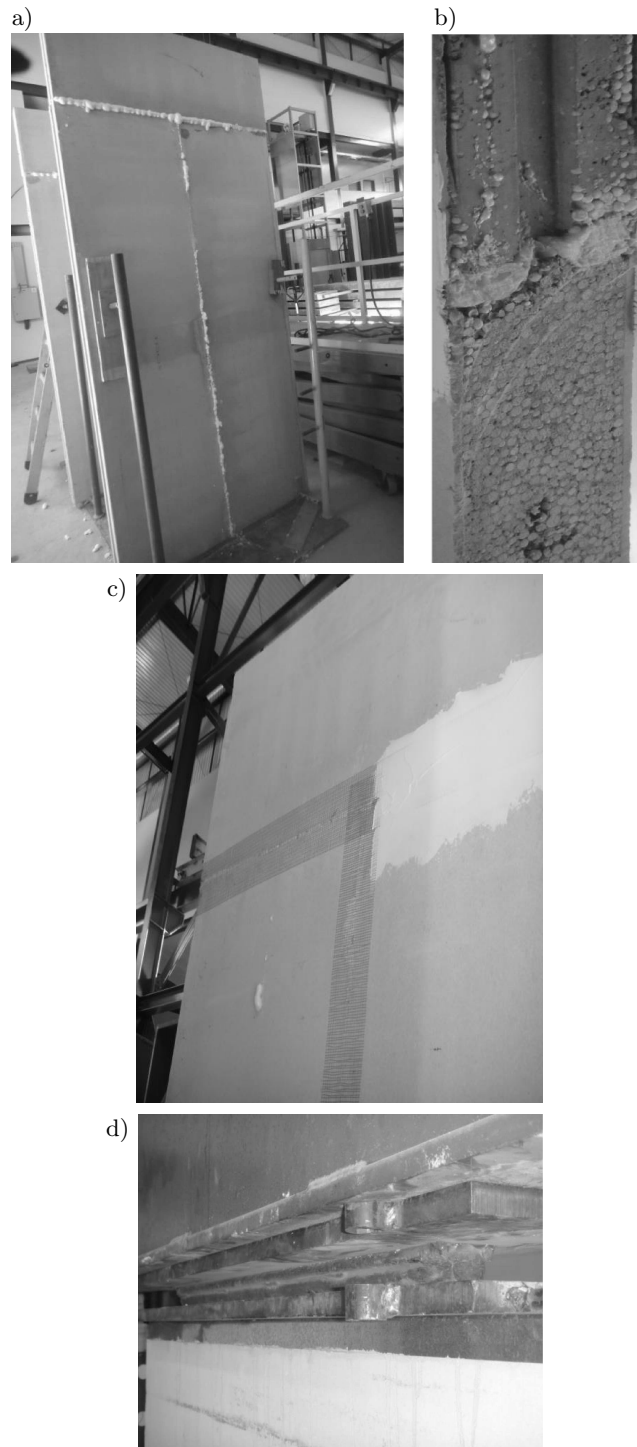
Photographs of the production of a building panel sample using concrete panels; a) concrete panels bounded by polyurethane foam; b) detail of a joint between two concrete panels; c) panel surface preparation using fabric net and gypsum; d) pinned top edge of the panel.
